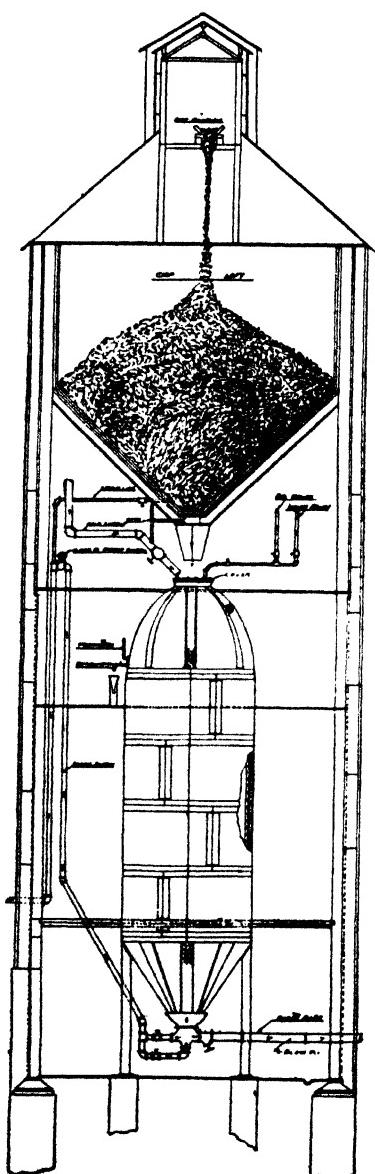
Cross-section of digester house showing chip conveyor, chip bins, digester, blow-pipe, and steam and acid connections.
